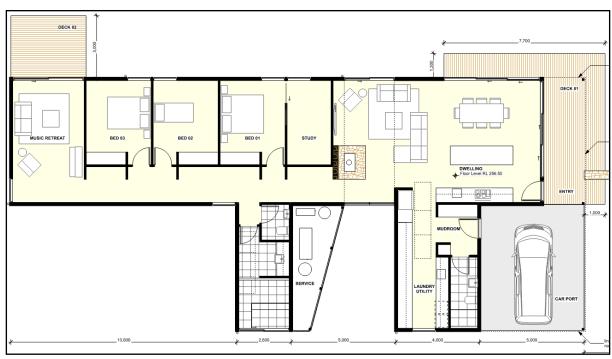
Excerpt of the Floor Plan showing the layout of the proposed dwelling.
